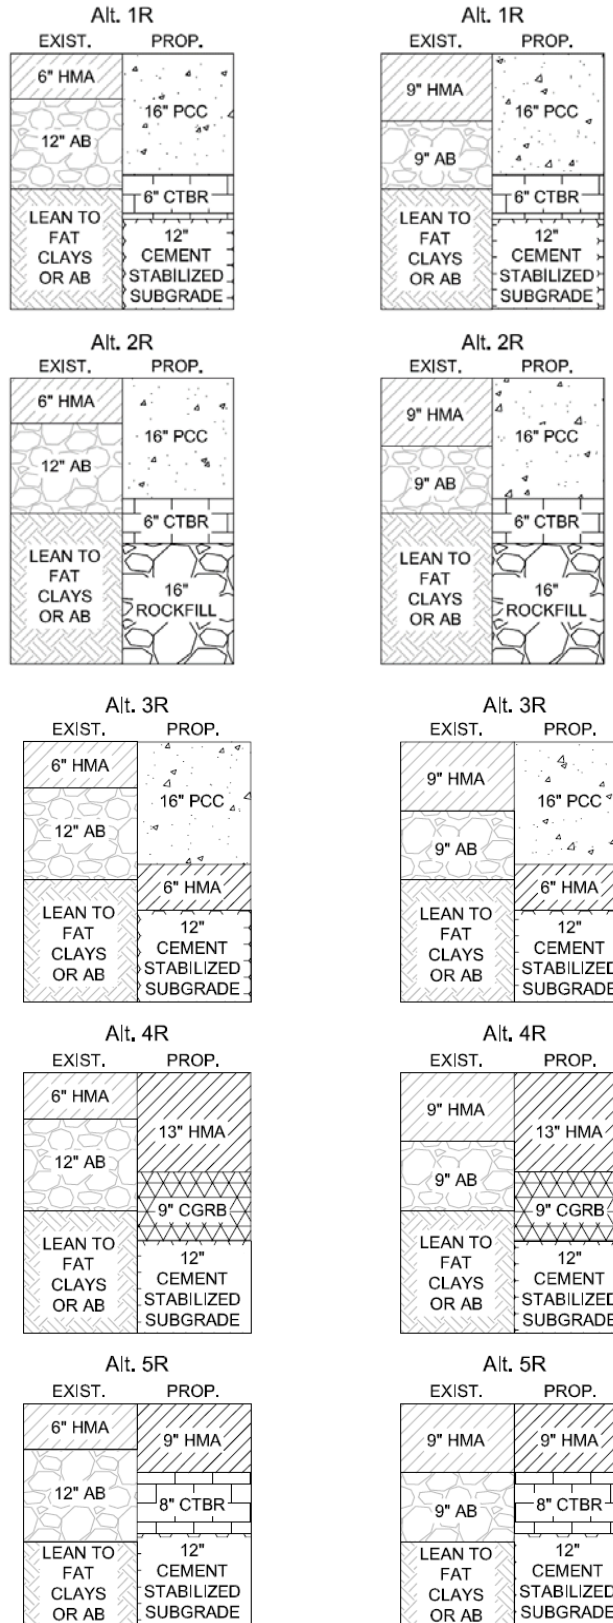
Alternative Standard Cross Sections for the Asphalt and Concrete Pavements
